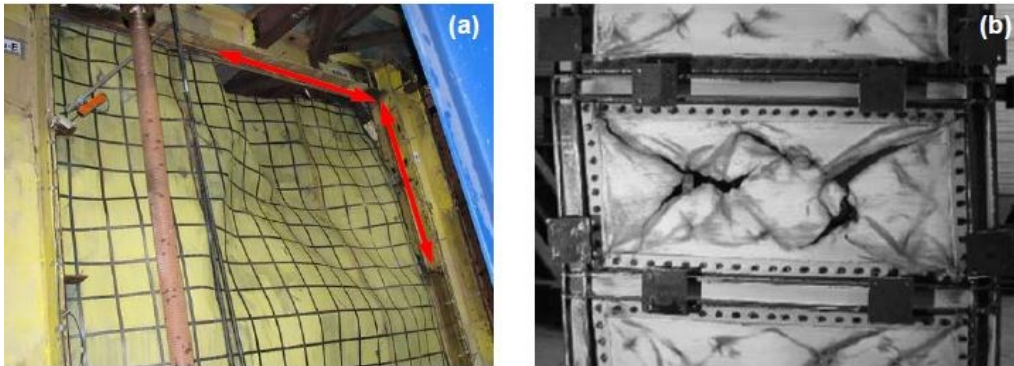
Web tearing creating strength deterioration: (a) Web tearing along vertical and horizontal fish plates (Qu and Bruneau 2009); (b) Web tearing across the infill plates (Choi and Park 2008)
